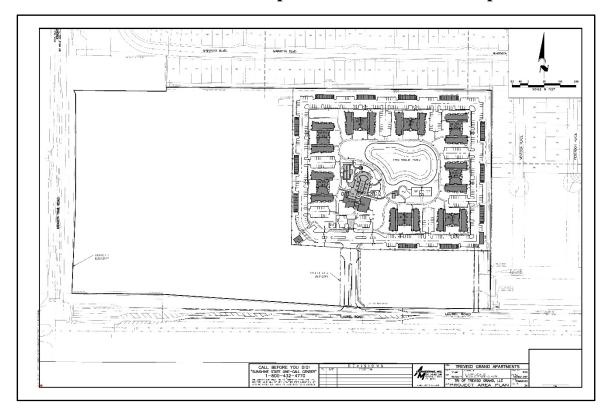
Treviso Grand Apartments Site and Development Plan
